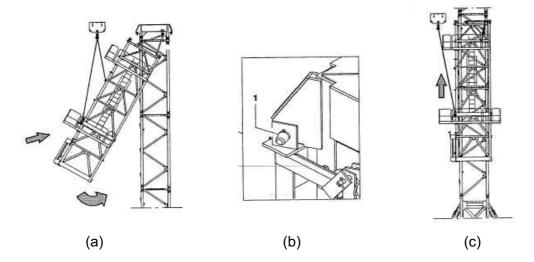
Method of installing telescopic cage: (a) Telescopic cage lifted and inserted into mast; (b) the top of the telescopic cage is locked first; (c) telescopic cage to be mounted on the mast
